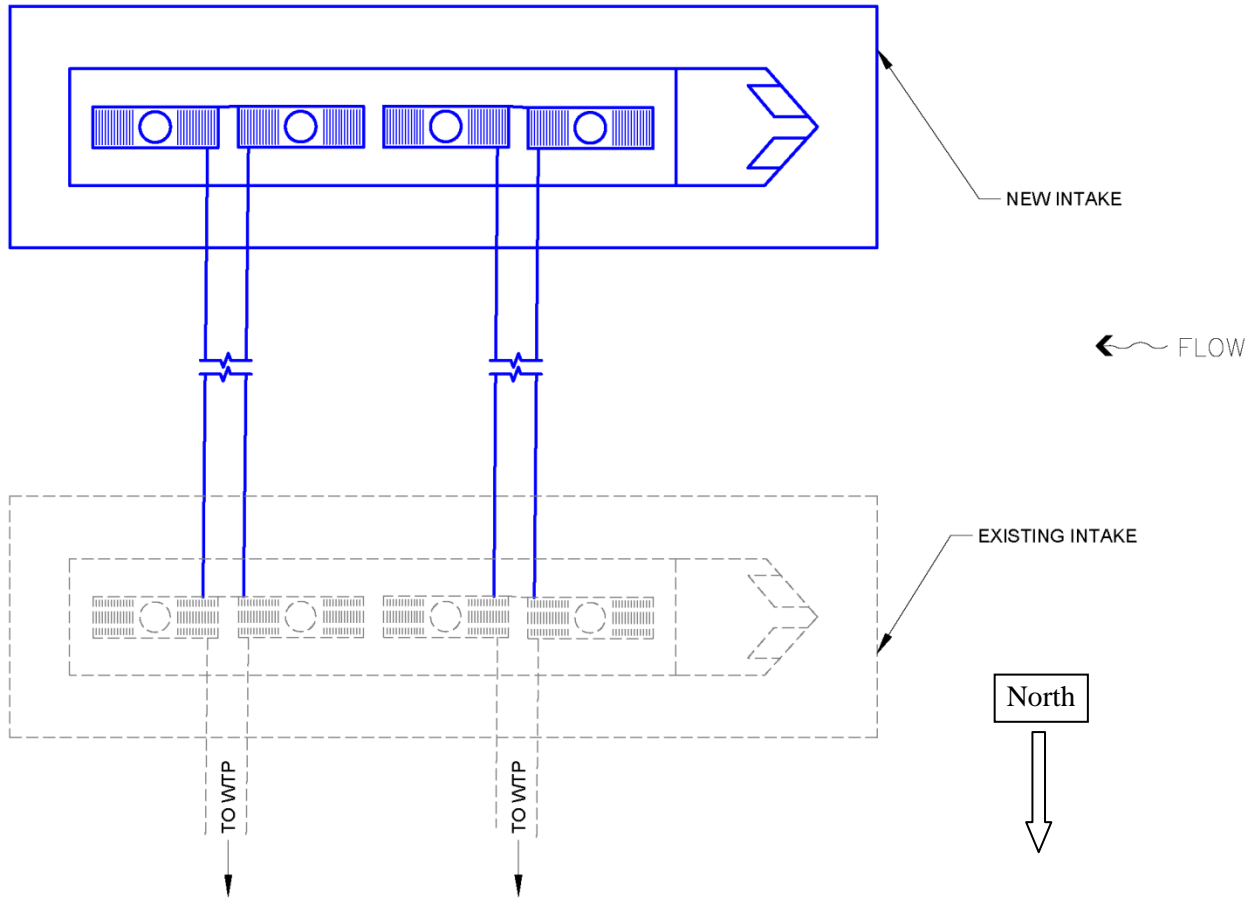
Schematic showing construction of new intake adjacent to existing intake
